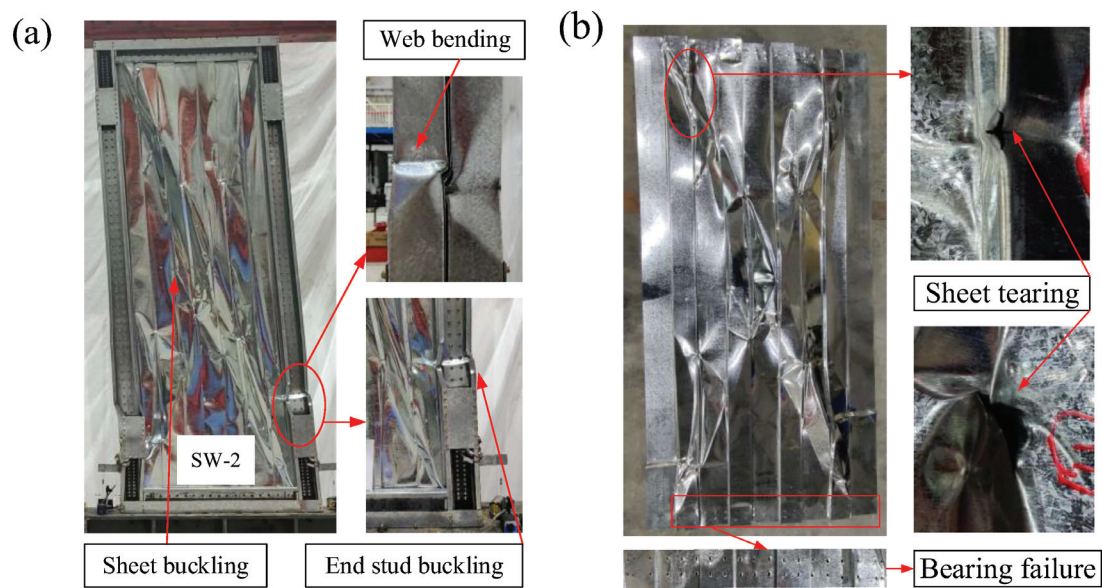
Failure modes of SW-2: (a) specimen SW-2; (b) corrugated steel sheet.
